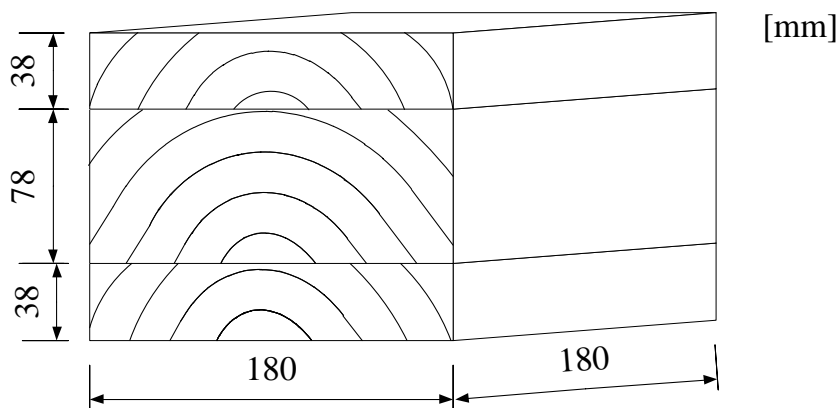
Shape and dimensions of test specimen in the frictional test performed by SP Trätekt.
